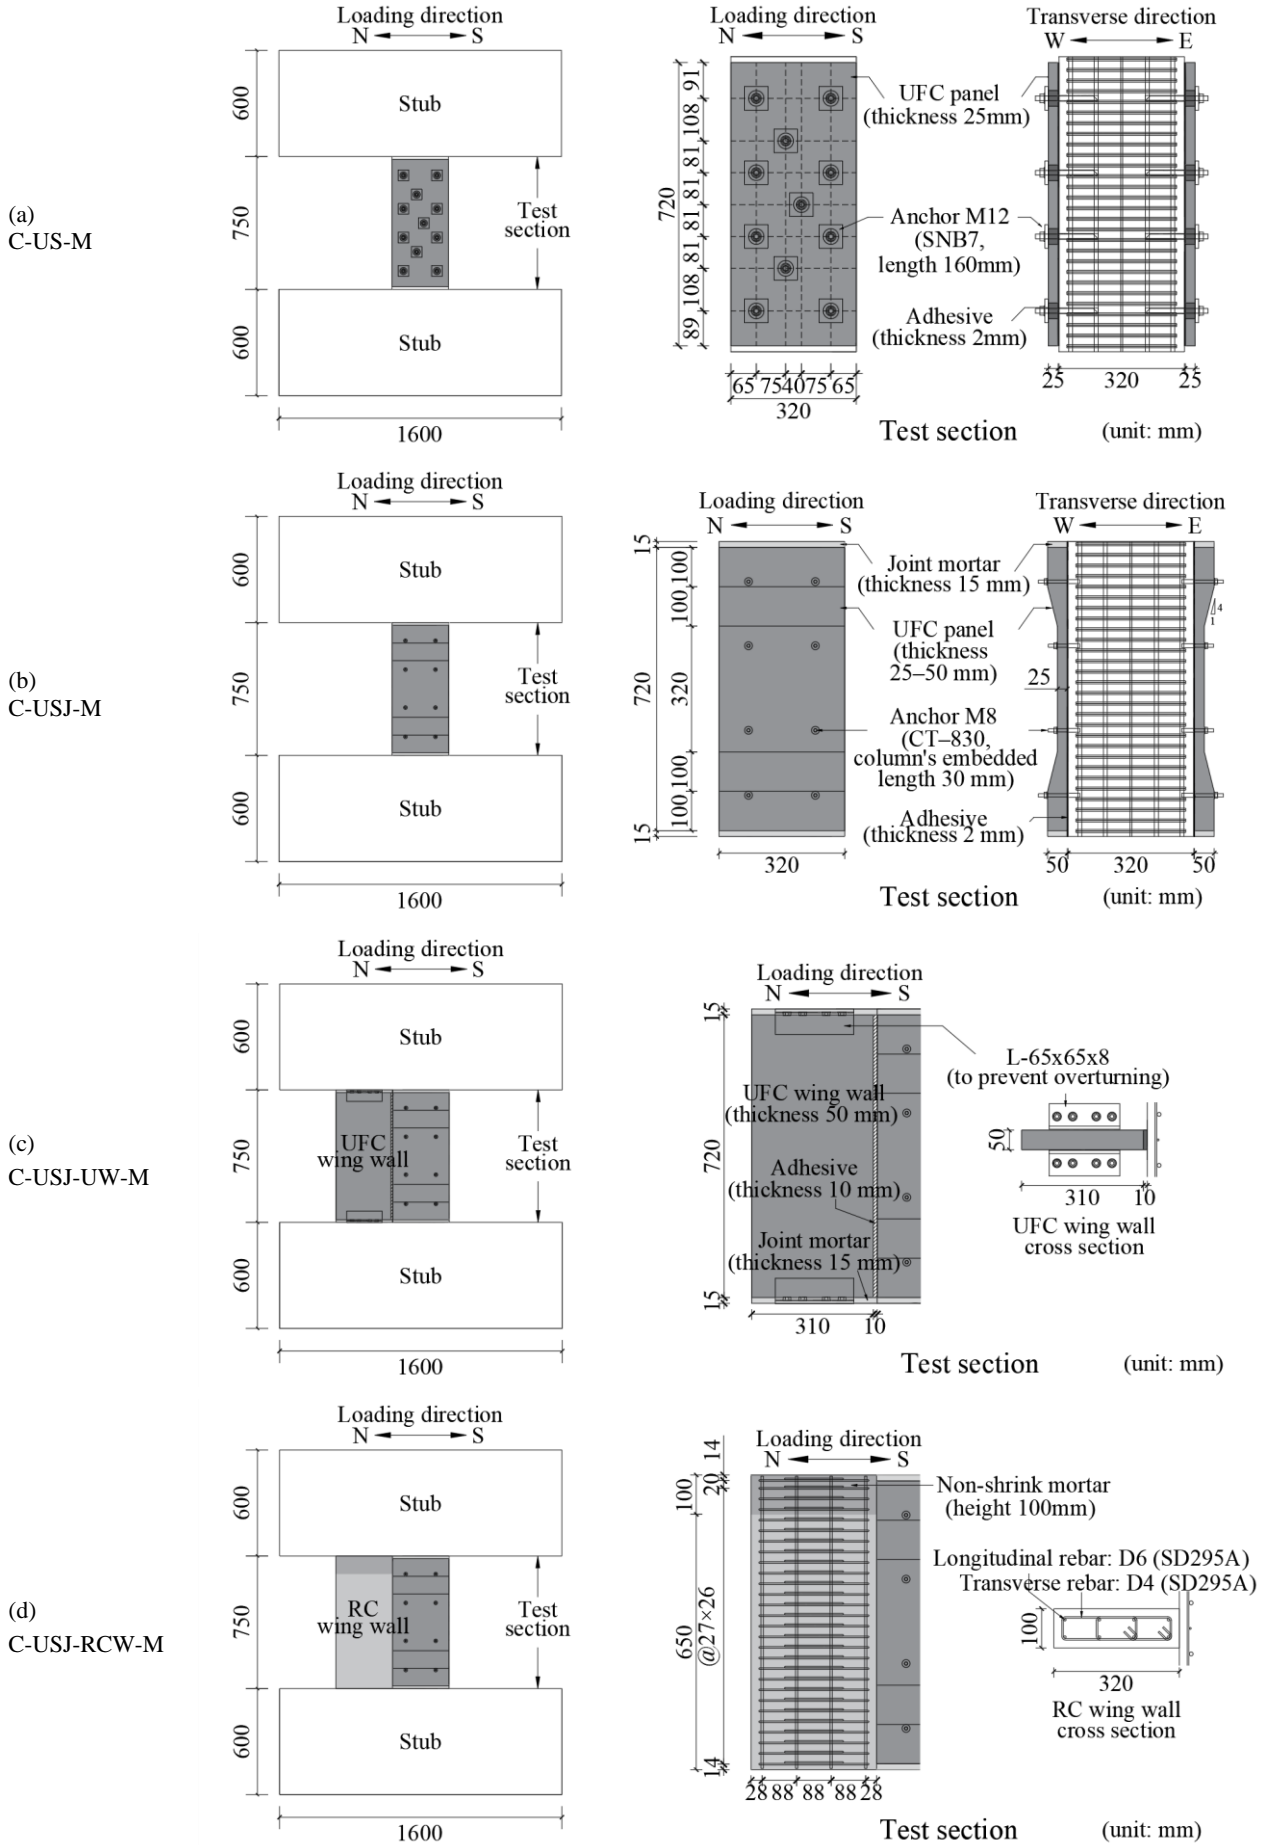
Overview of strengthened specimens (C-US-M: column-UFC sandwich panels; C-USJ-M: column-UFC sandwich panels with joints; C-USJ-UW-M: C-USJ-UFC wing wall; C-USJ-RCW-M: C-USJ-RC wing wall).
